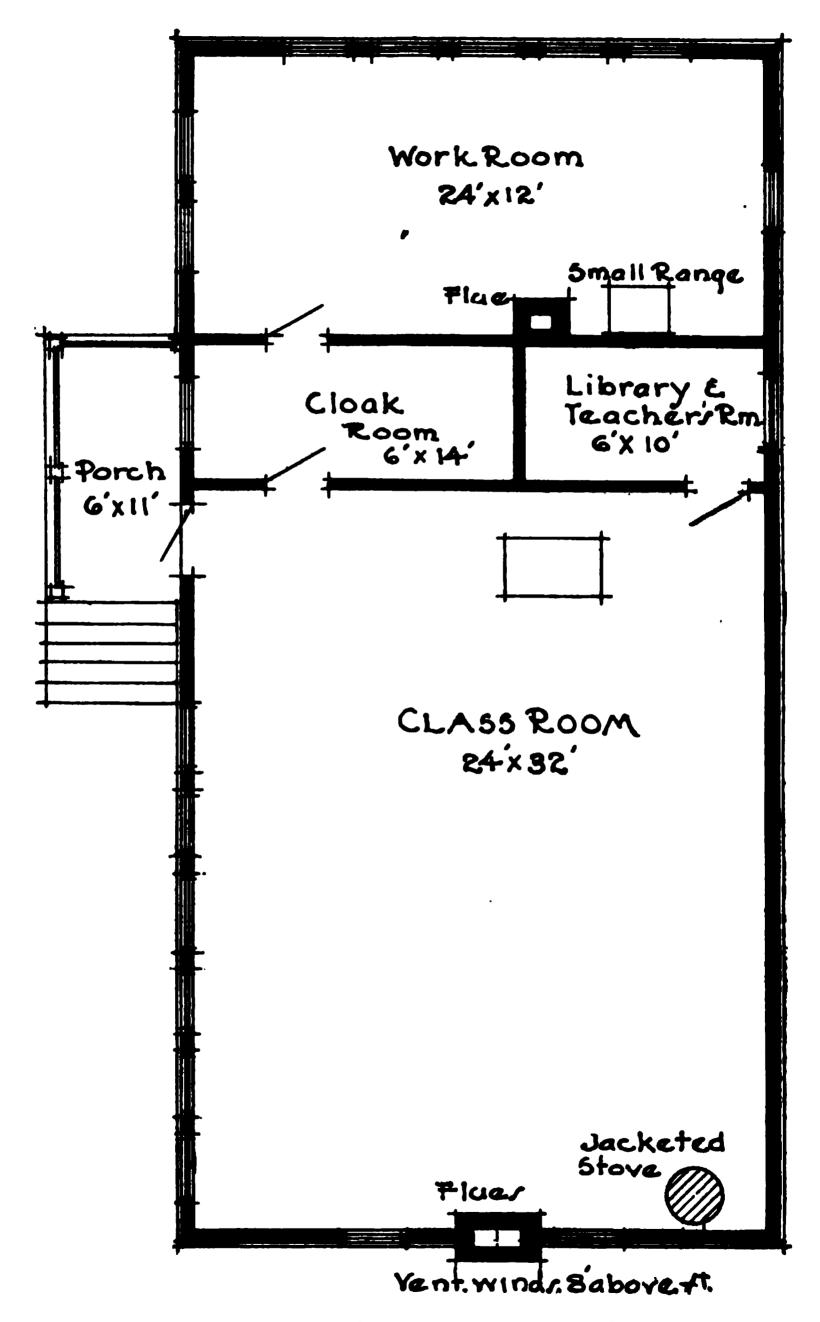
Rearranged floor plan of building shown in fig. 11.
